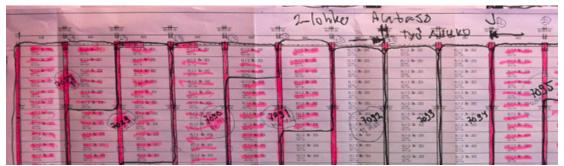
Image of how the actual installation schedule of precast concrete is documented and managed in Toriparkki construction project.
